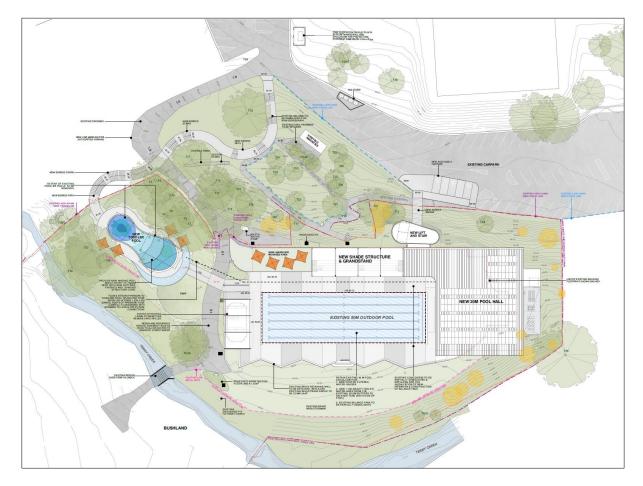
Site Plan of subject site (Source: Brewster Hjorth Architects)
